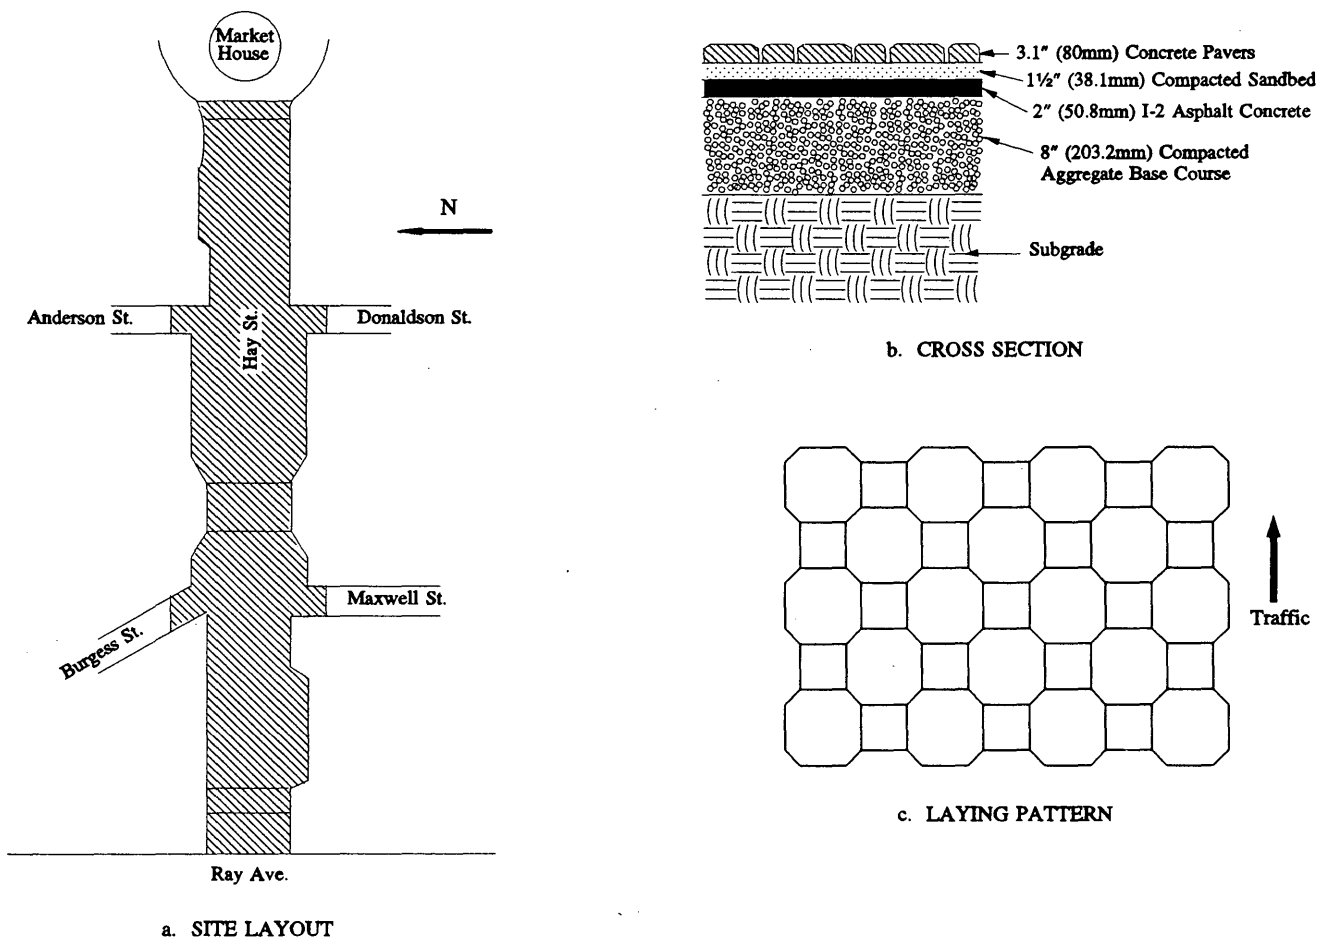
North Bay, Ontario: site layout, pavement cross section, and laying pattern.
